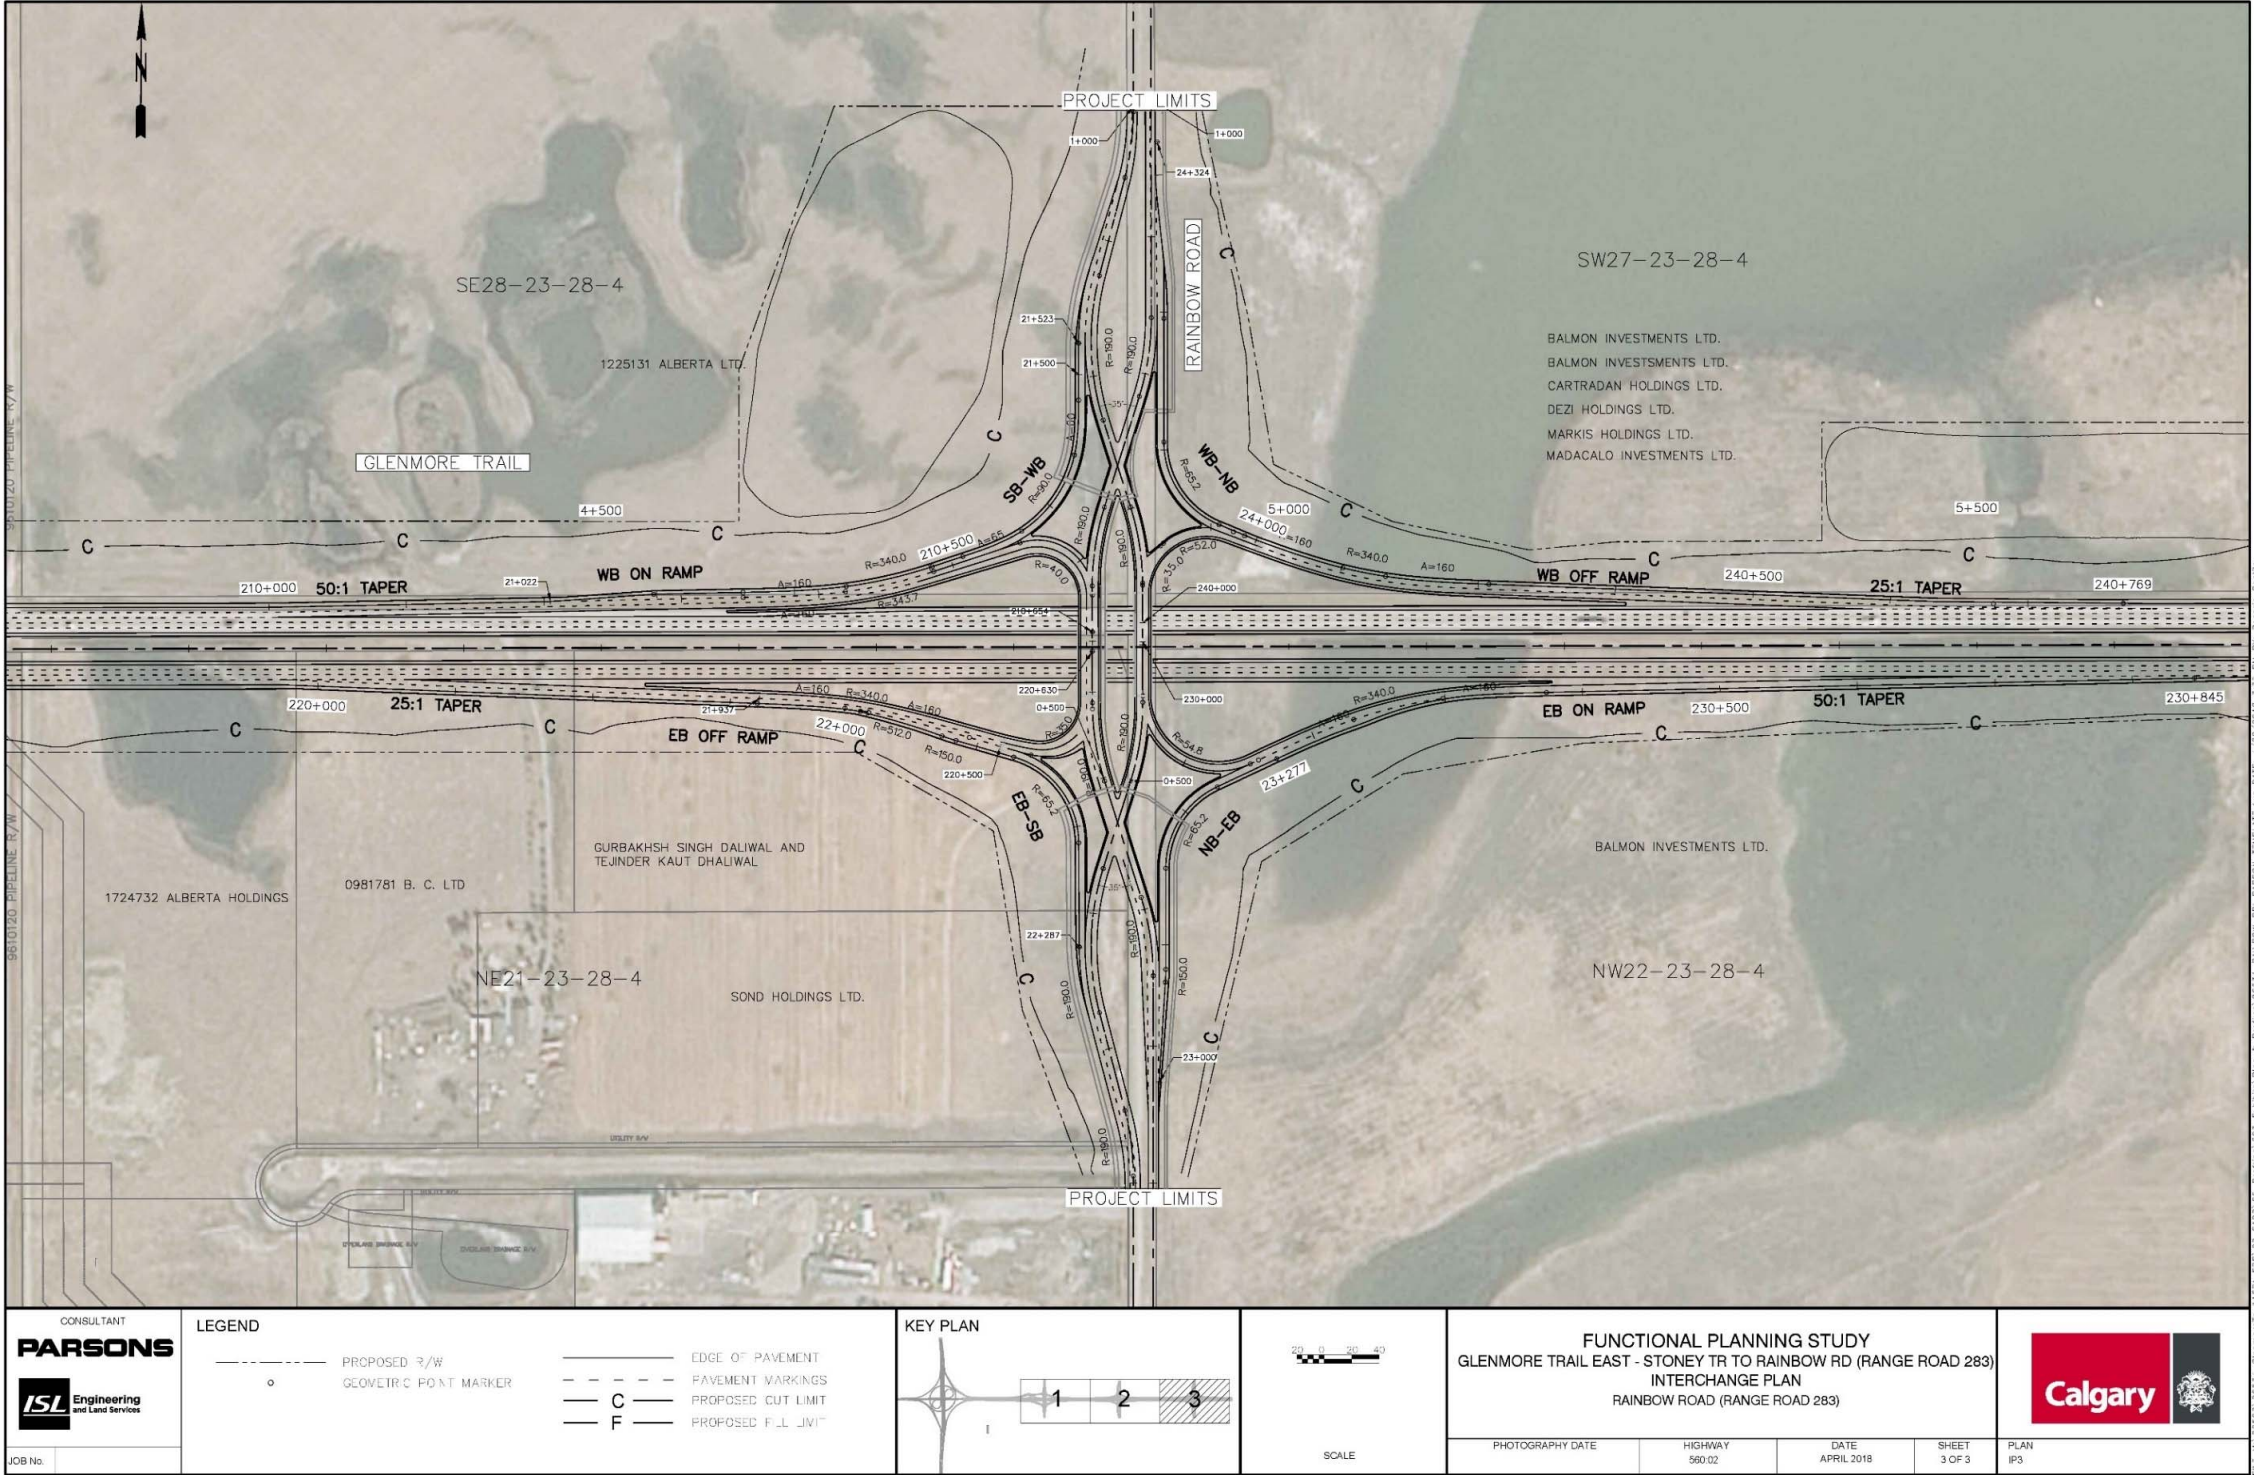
RECOMMENDED PLAN -RAINBOW ROAD
